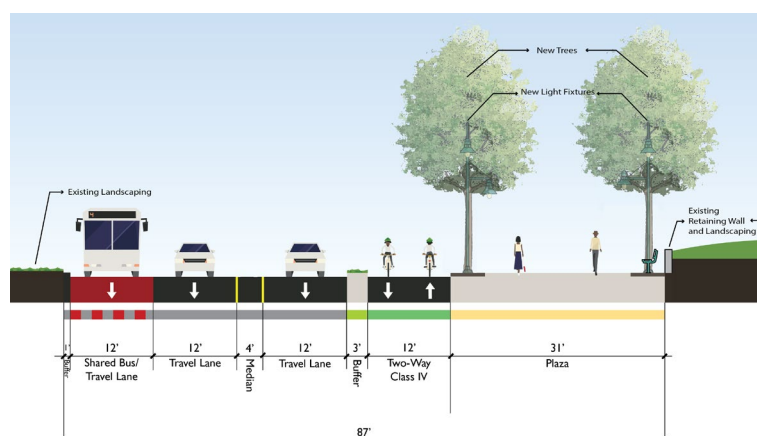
Shellmound Street at the new plaza (looking north) – SECTION J
